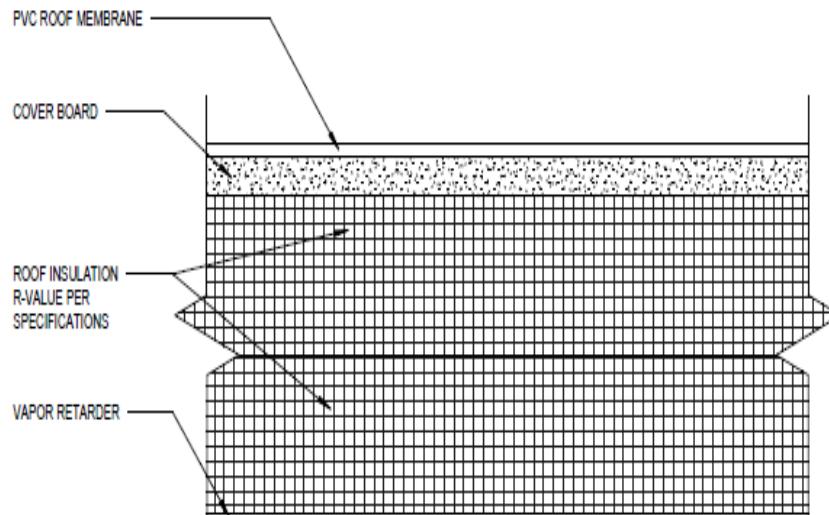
| Typical Concrete Roof Section (SmithGroupJJR)
